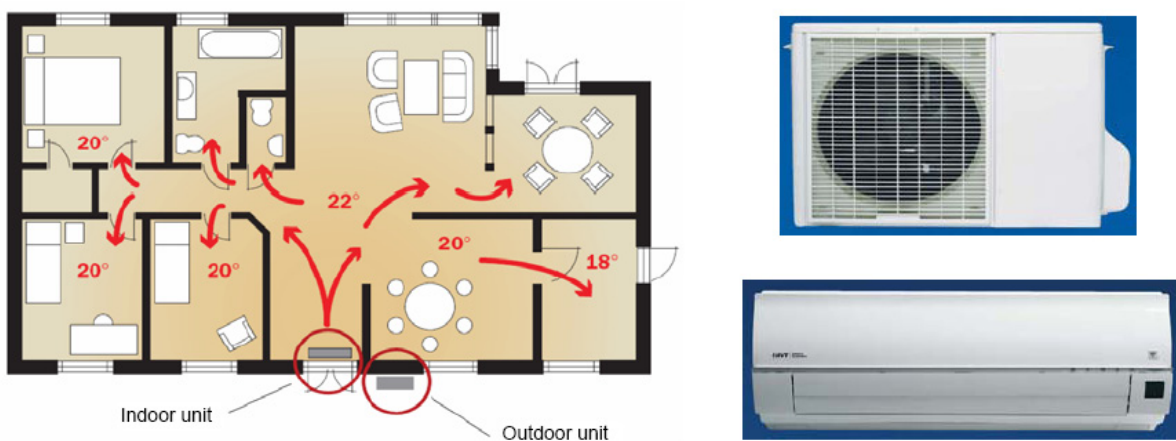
Installation floor plan of an air-to-air heat pumps (left) and outdoor and indoor unit (right) (taken from Stene, 2007)
